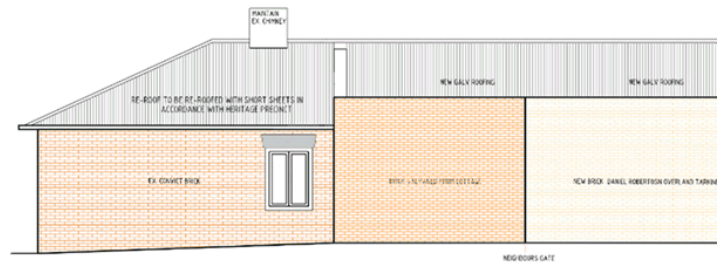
Extract of the proposed southern elevation showing the difference in height of the existing cottage side wall (left) and the proposed extension boundary wall (centre and right). Source: Applicant's documentation, Shurman Design, drawing A06, 'Elevations Proposed', 20.10.2025.
